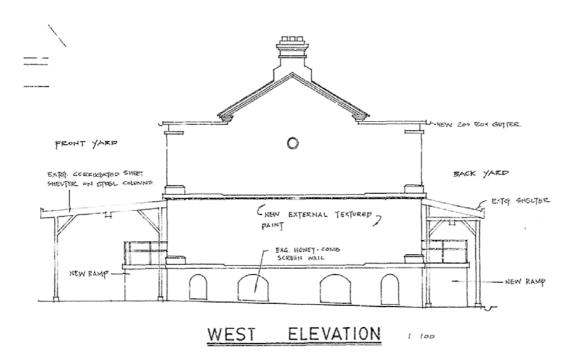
Proposed renovation on west façade, extracted from Architectural Proposed Plan for Kowloon Park, Drawing No. ASM/ 5704, dated 1986. (Source: Architectural Services Department)
